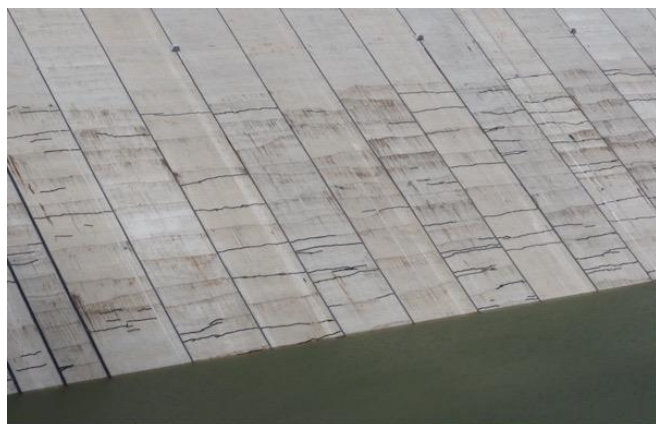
Repaired shrinkage cracks in the face slab of the Nam Ngum 2 CFRD in Laos
